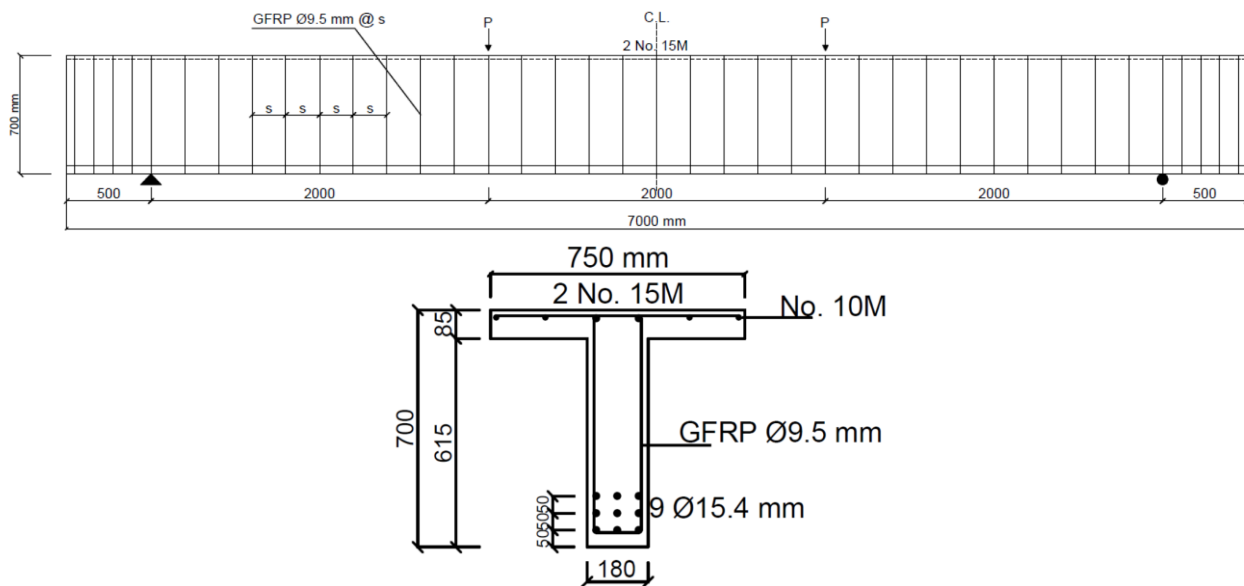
Dimension, Reinforced Details, and Test Scheme of Beam [1]
